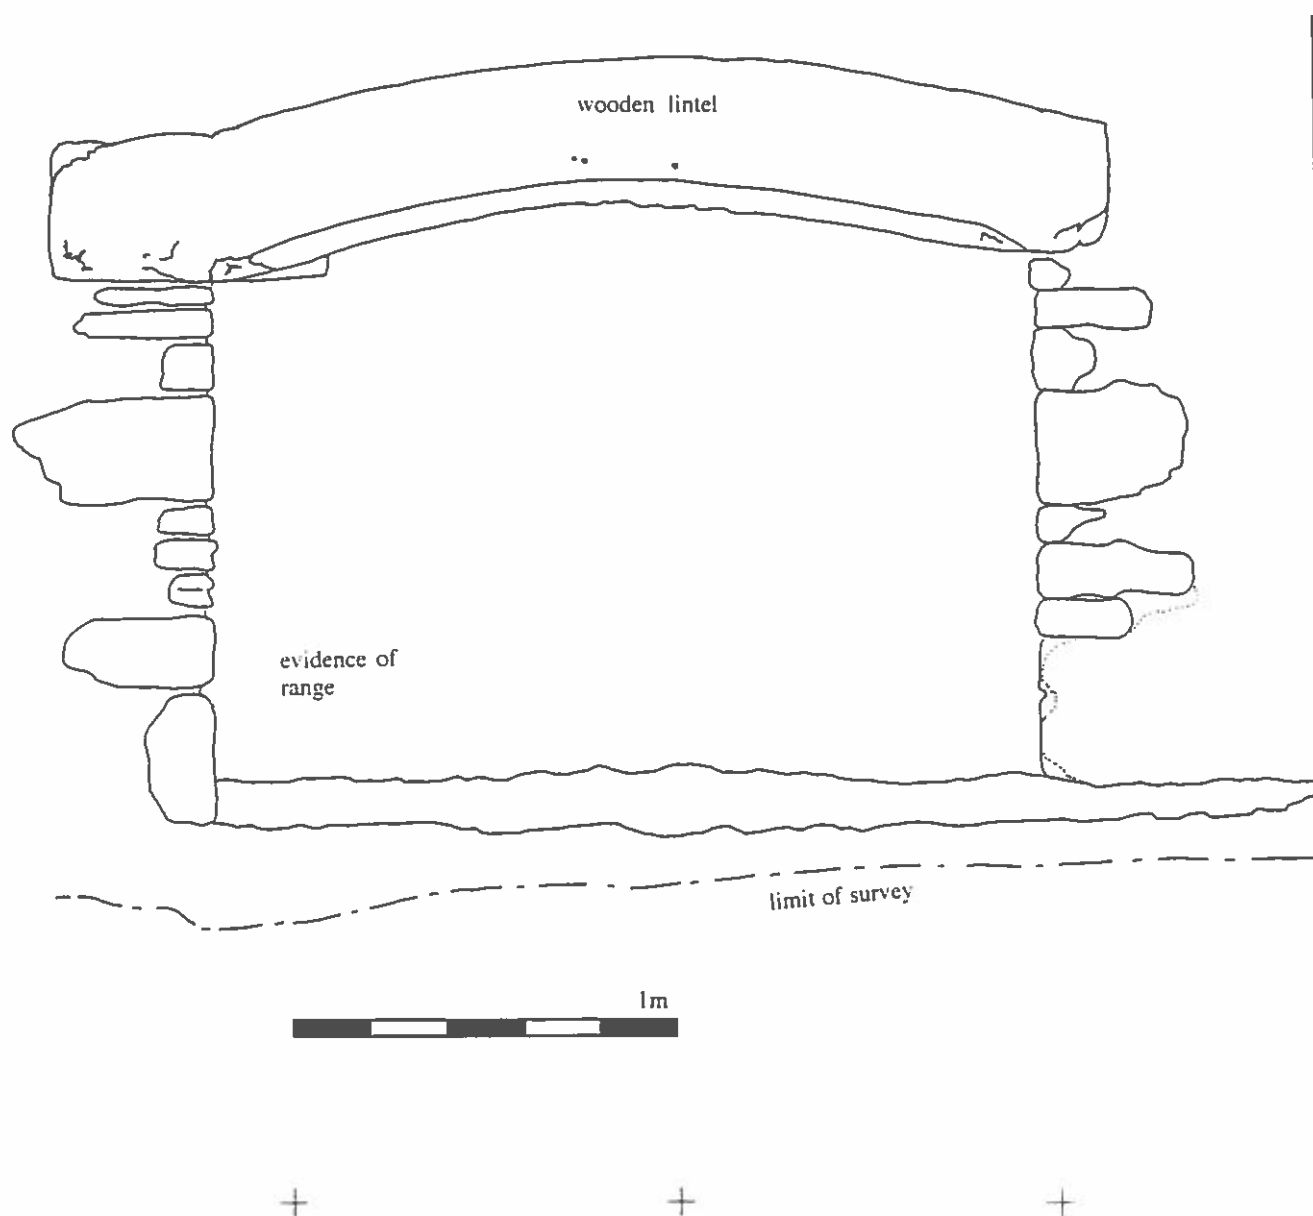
AREA B: NORTH-FACING INTERNAL ELEVATION
